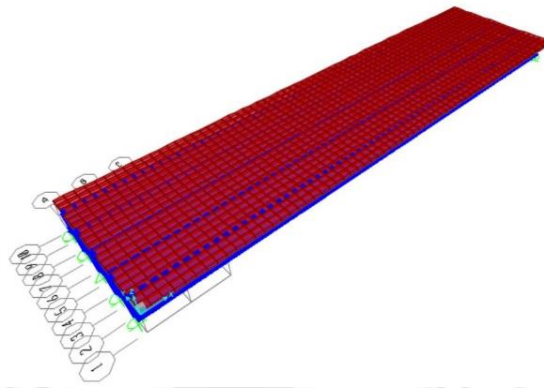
FE model of the composite plate girder bridge with mesh
